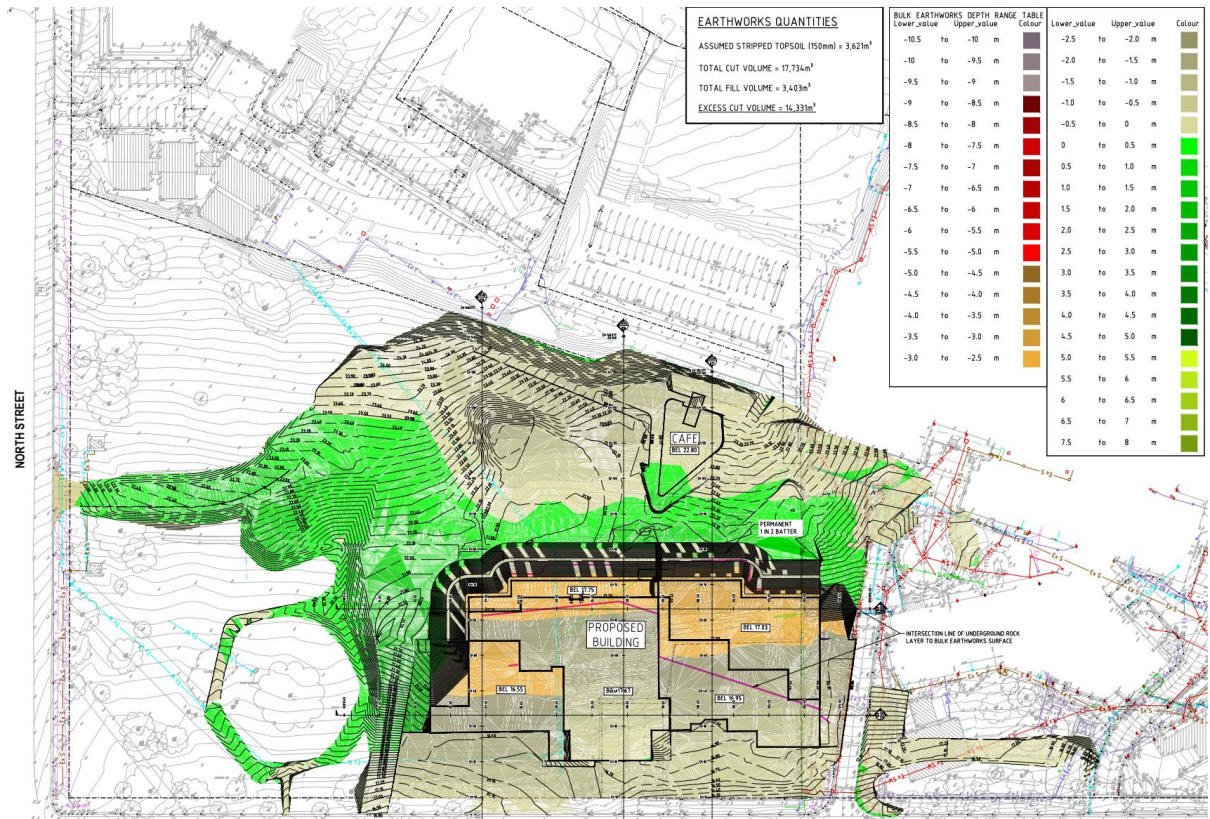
Bulk earthworks cut and fill plan (Bonacci)
